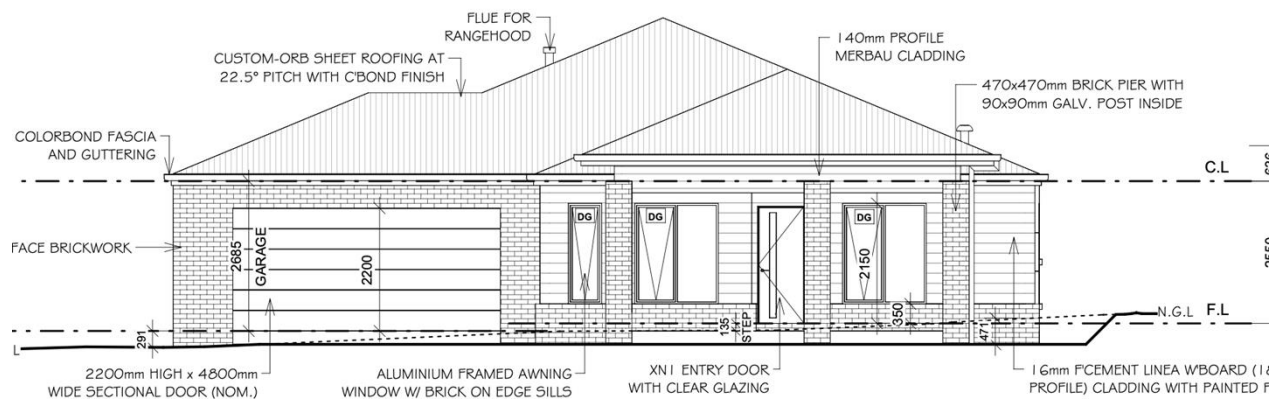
Extract from plans showing proposed front elevation presentation to Haggar Street.
